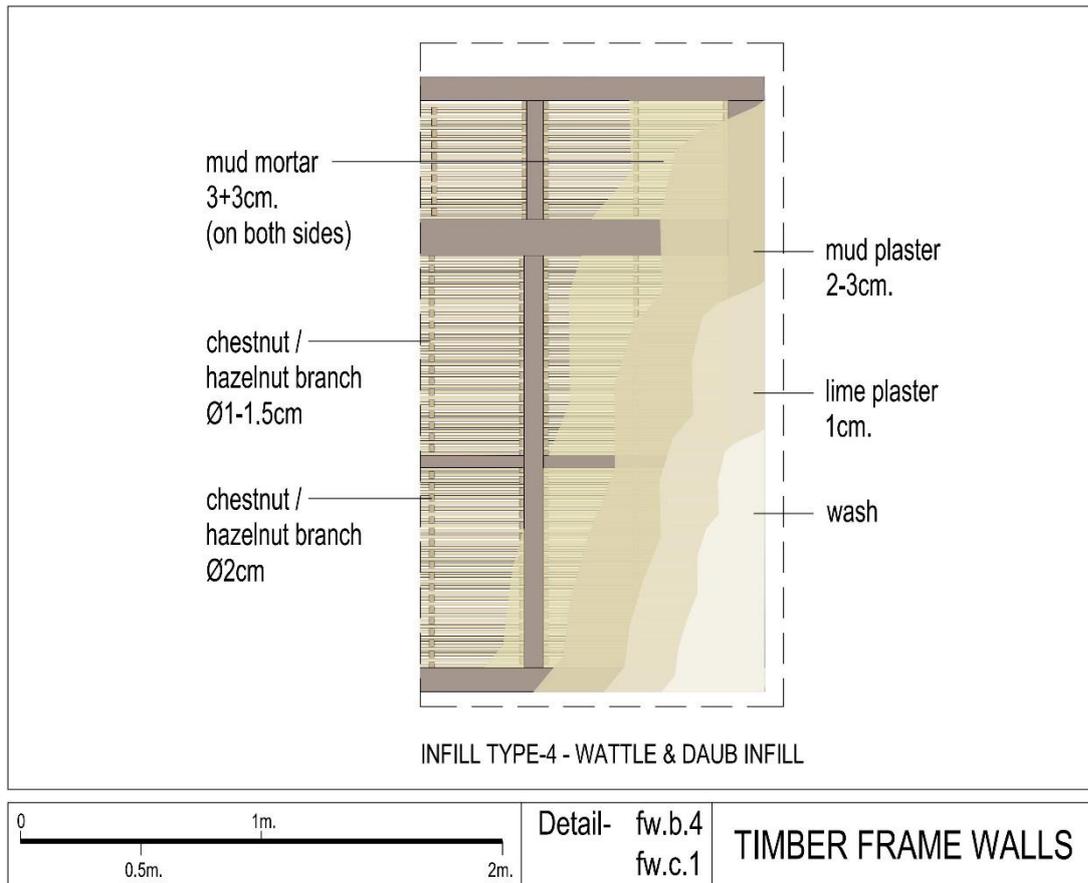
Detail of timber frame walls with wattle and daub infill
